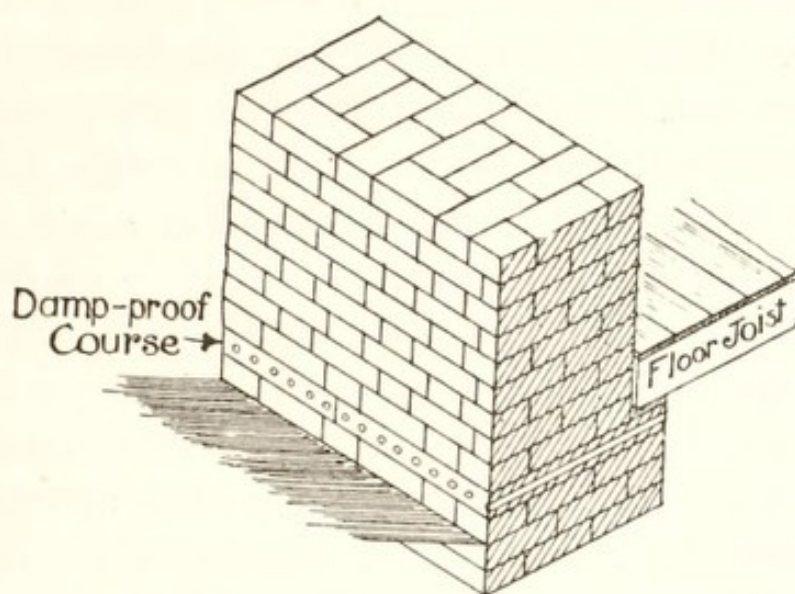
DAMP-PROOF COURSE OF GLAZED PERFORATED BRICKS WHICH OFFER SUB-FLOOR VENTILATION.
